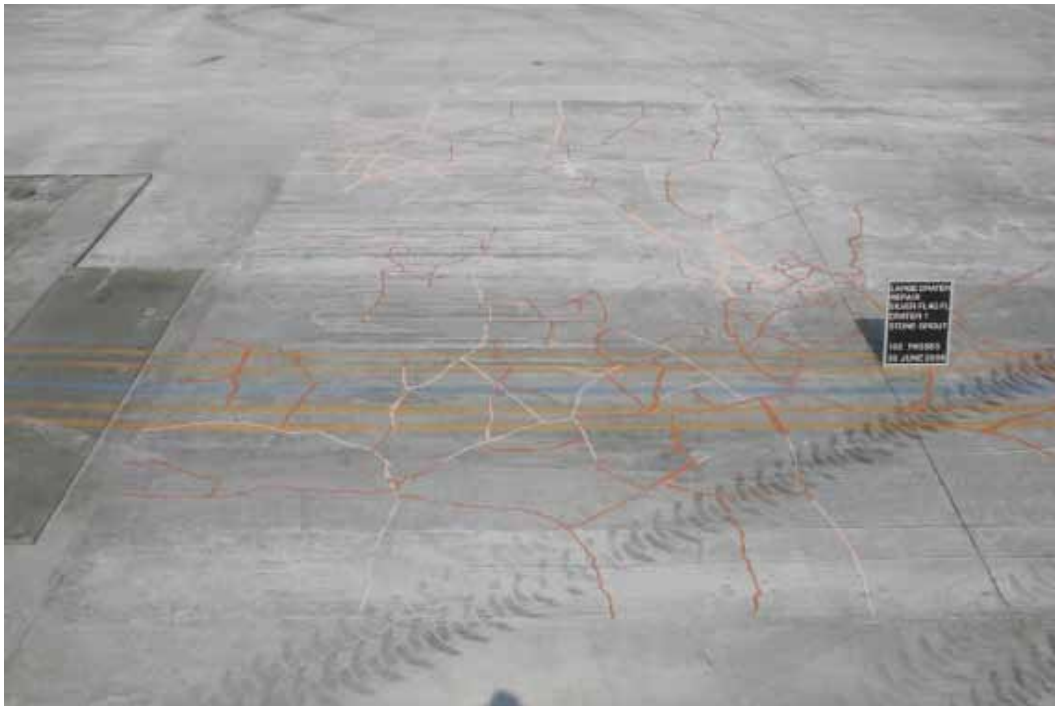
Crater 1, Stone & grout after 102 passes of load cart.
